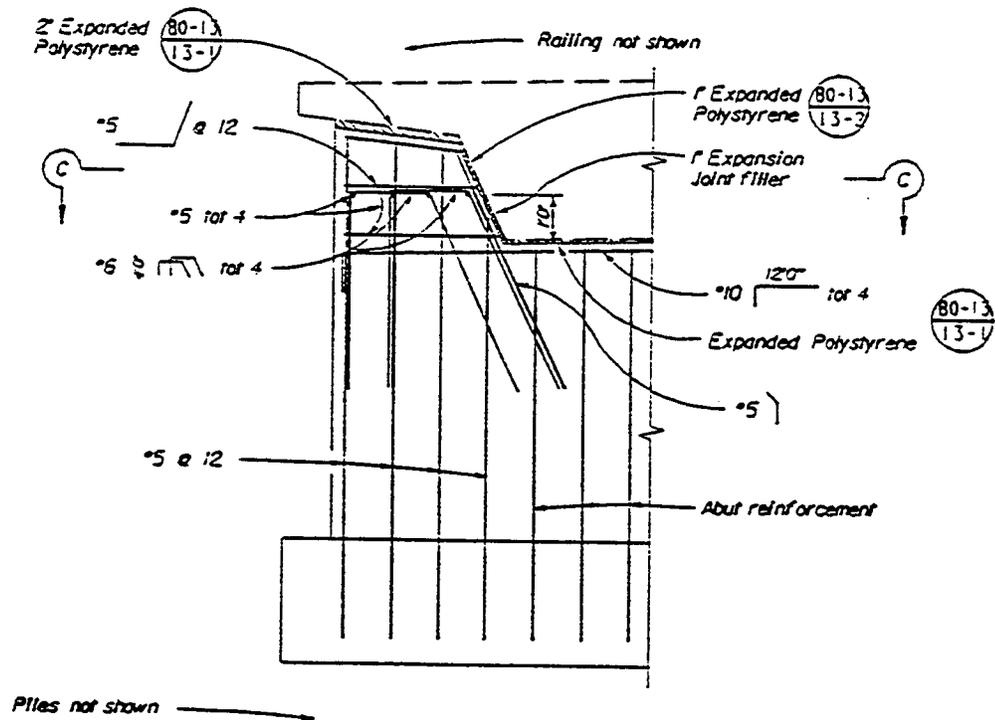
Precast Concrete I-Girder Depressed Shear Key at Abutment Details
